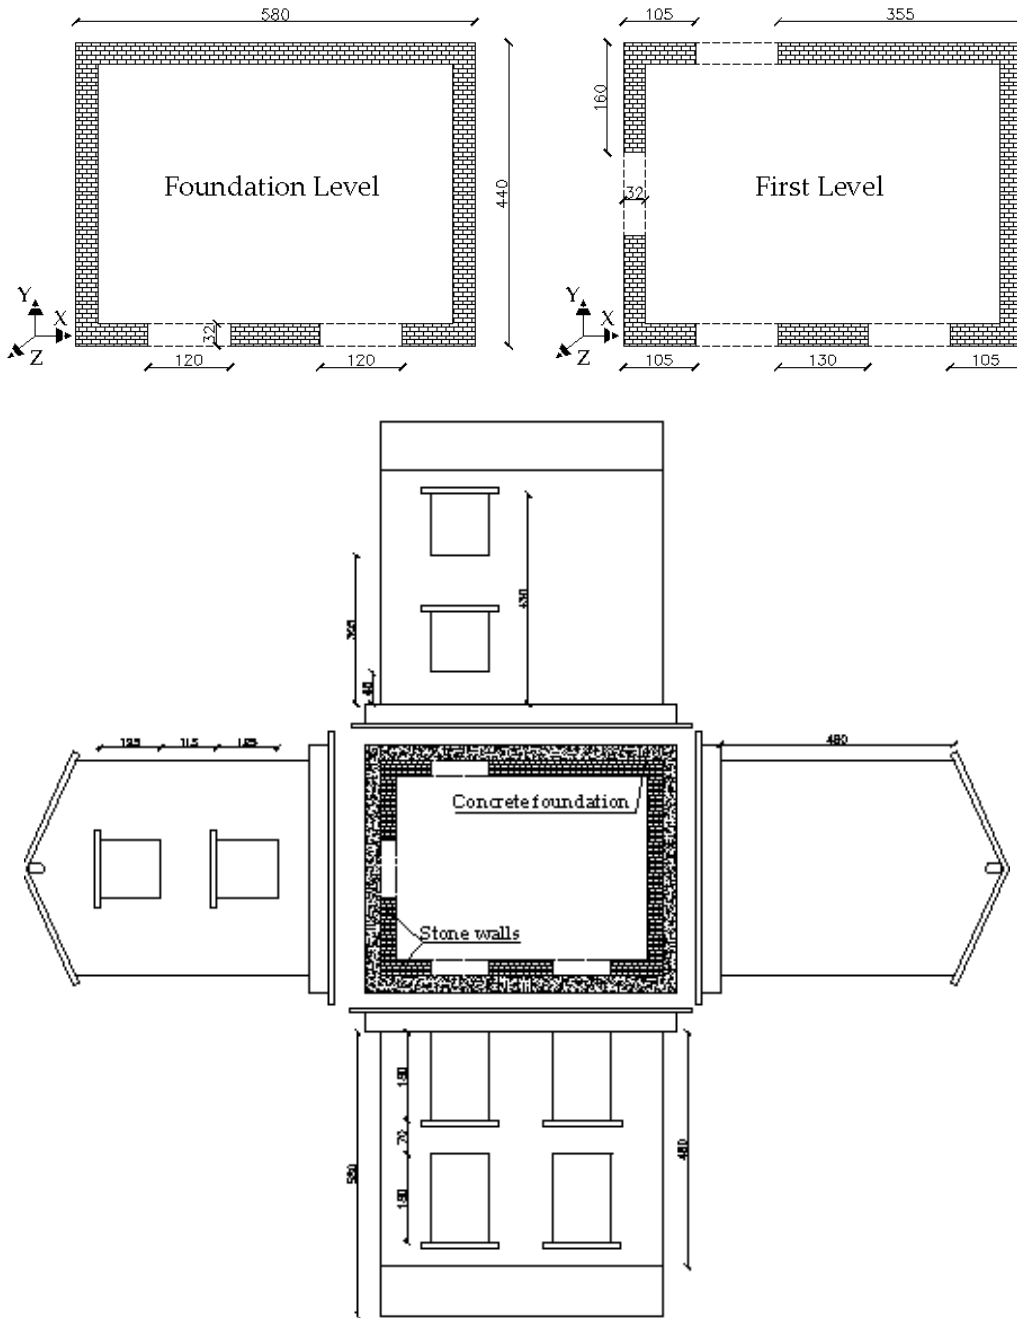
The un-reinforced stone building: plan view (top); sectional view (bottom)
